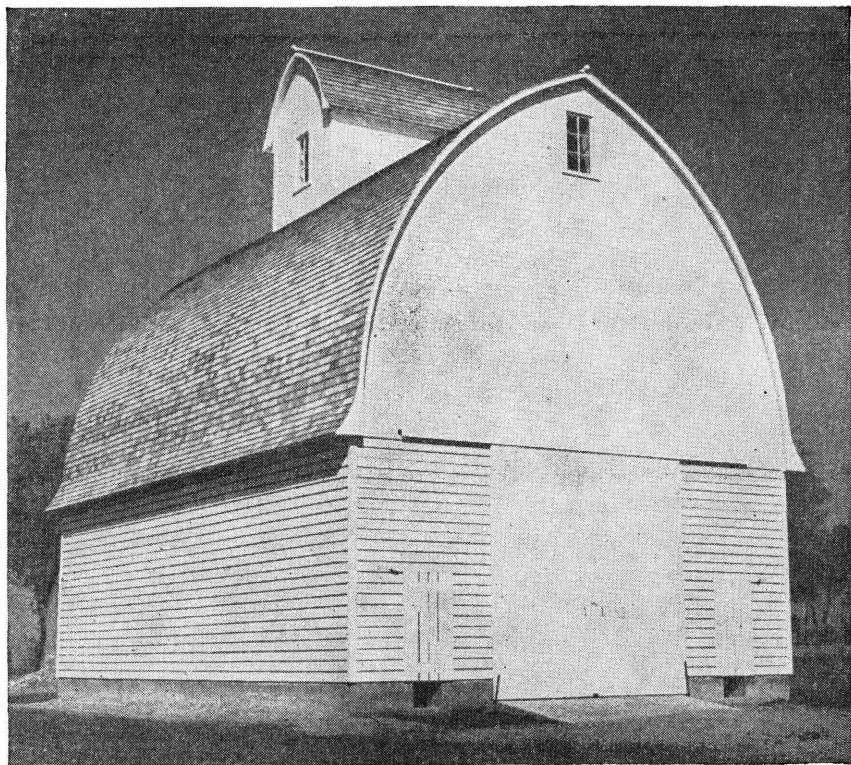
Double crib with vertical stationary elevator and bins over driveway. Note shelling trenches.
